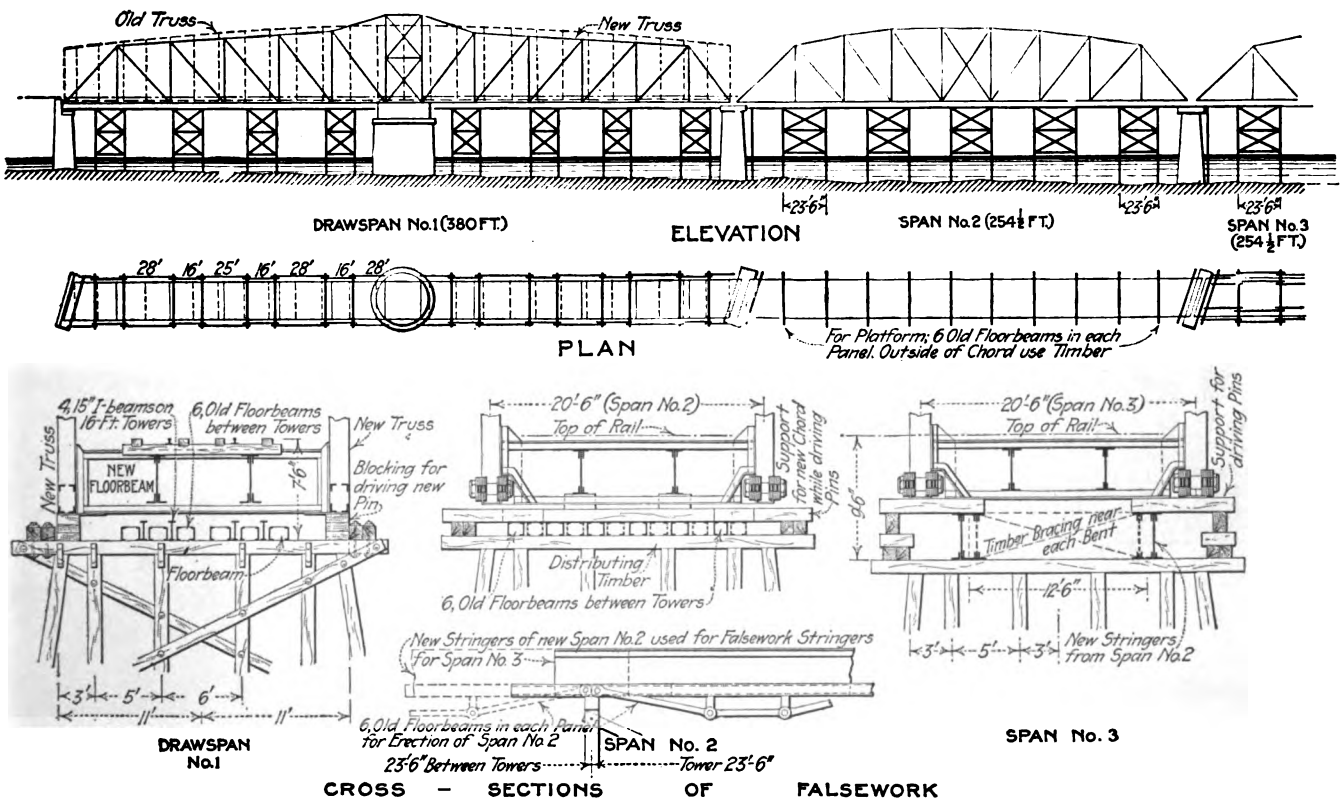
FALSEWORK AND PLATFORMS FOR THE 380-FT. DRAWSPAN AND TWO 254 1/2-FT. FIXED SPANS
